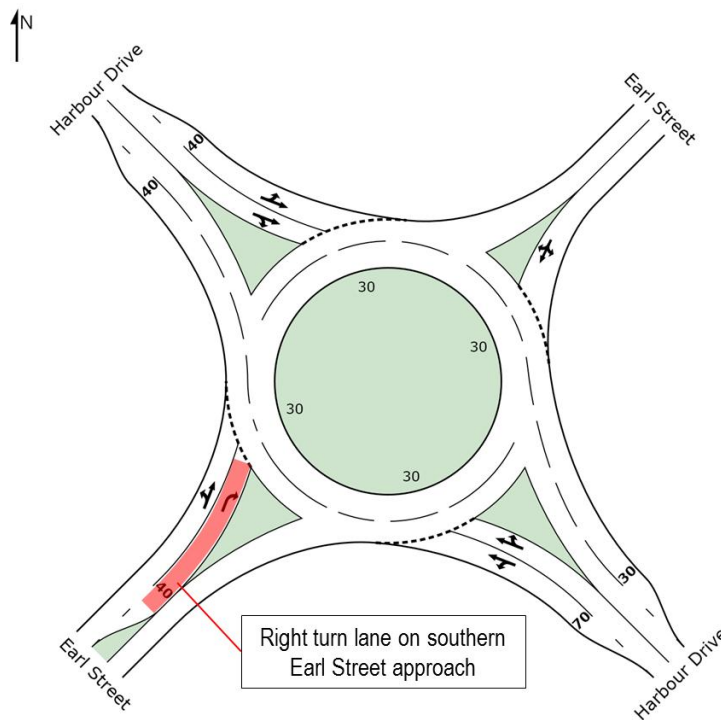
Site 6: Harbour Drive / Earl Street Upgraded Layout
